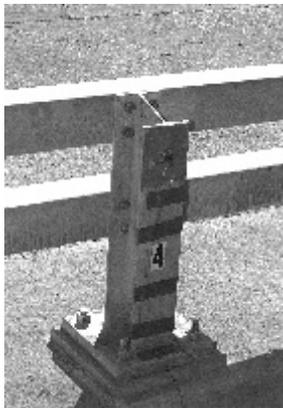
New York Two-Rail Curbless Bridge Railing prior to testing.
